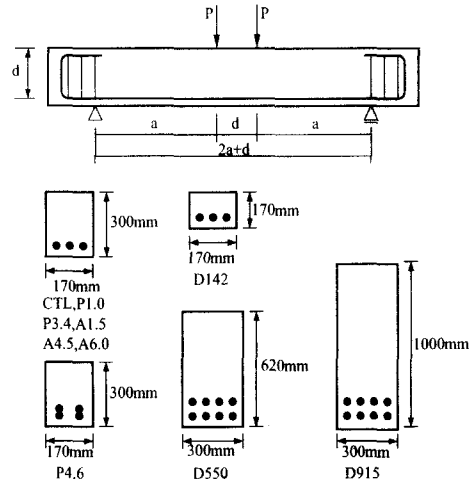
Loading and Support Conditions and Sectional Details for KAIST Beams⁽¹²⁾
